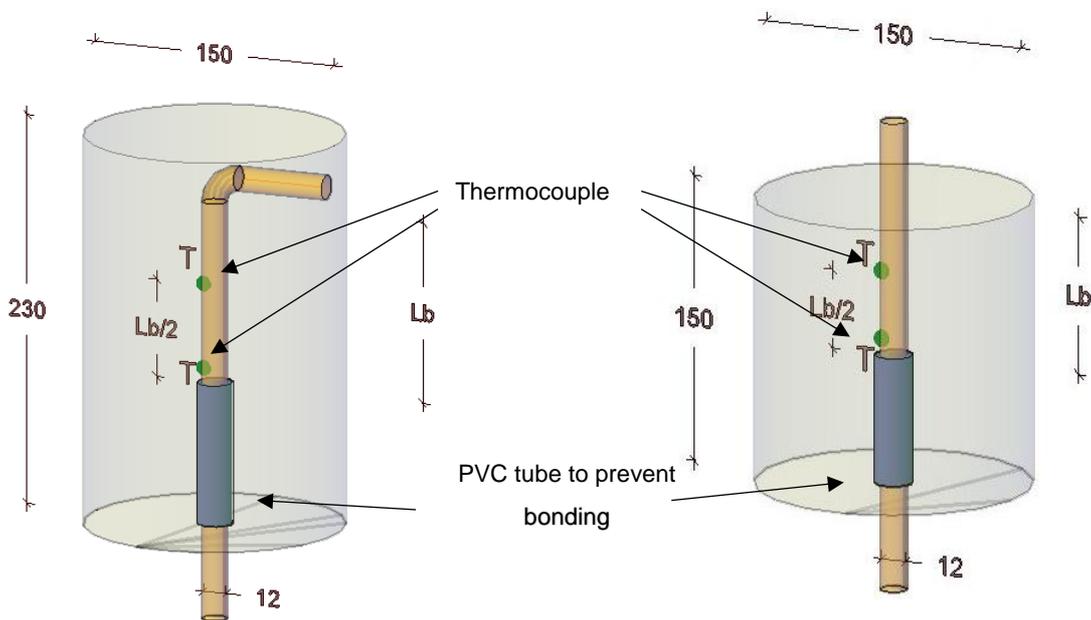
Pull-out test specimens geometry and thermocouples placement: (left) bent rebars; (right) straight rebars), (dimensions in mm).
